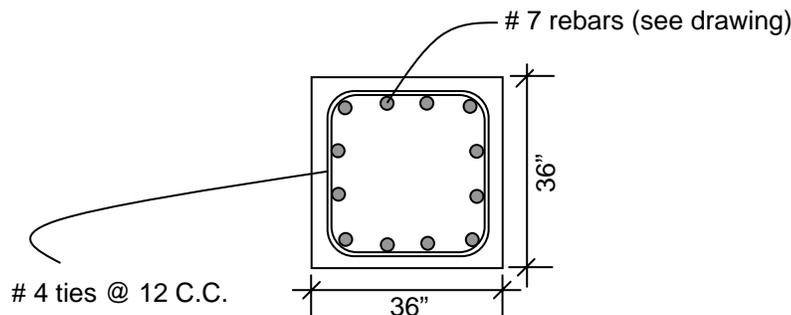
Section A-A of columns of the US68-US62 connector bridge.
